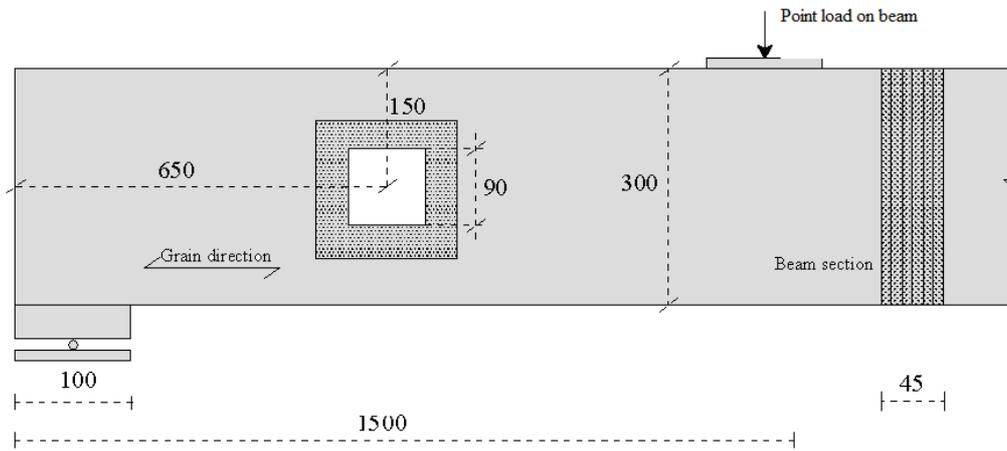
Beam with hole reinforced with plywood (dimensions in mm).
